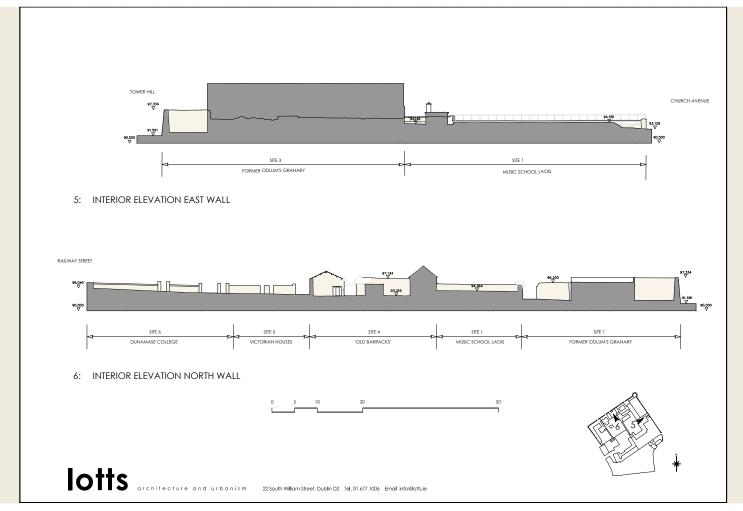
Survey drawing (interior elevation East Wall and interior elevation North Wall)
